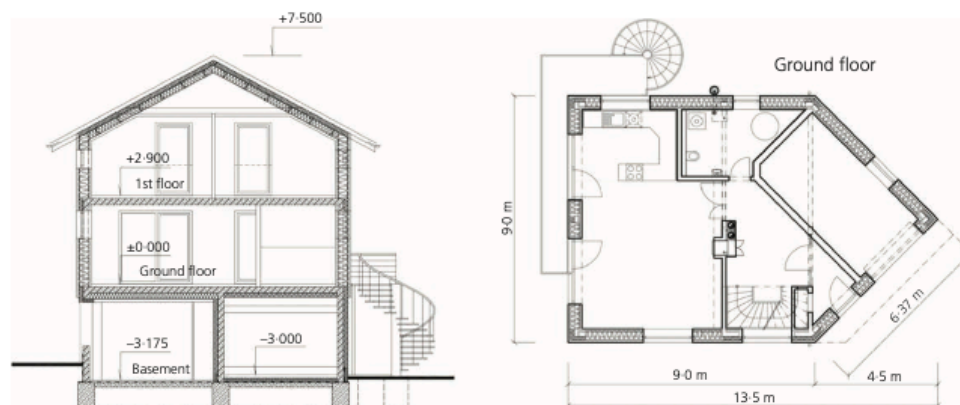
A family house (CS3). Left: cross-section. Right: plan of ground floor. Source: investor's documentation for building permit
